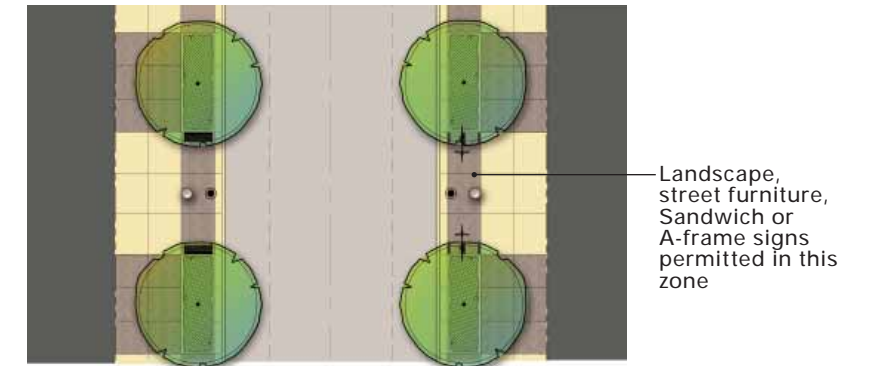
Plan view of landscape/street furniture zone between street trees
